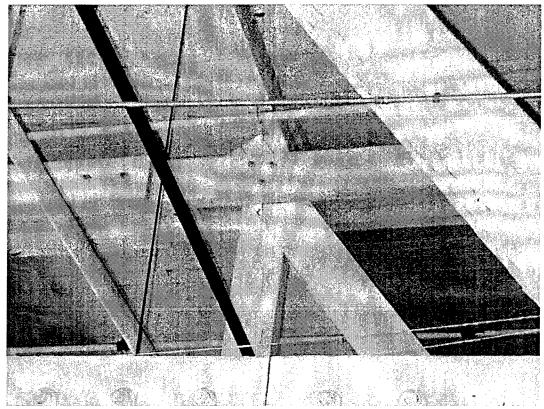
Fractured member QM of Truss 27, Area A.
